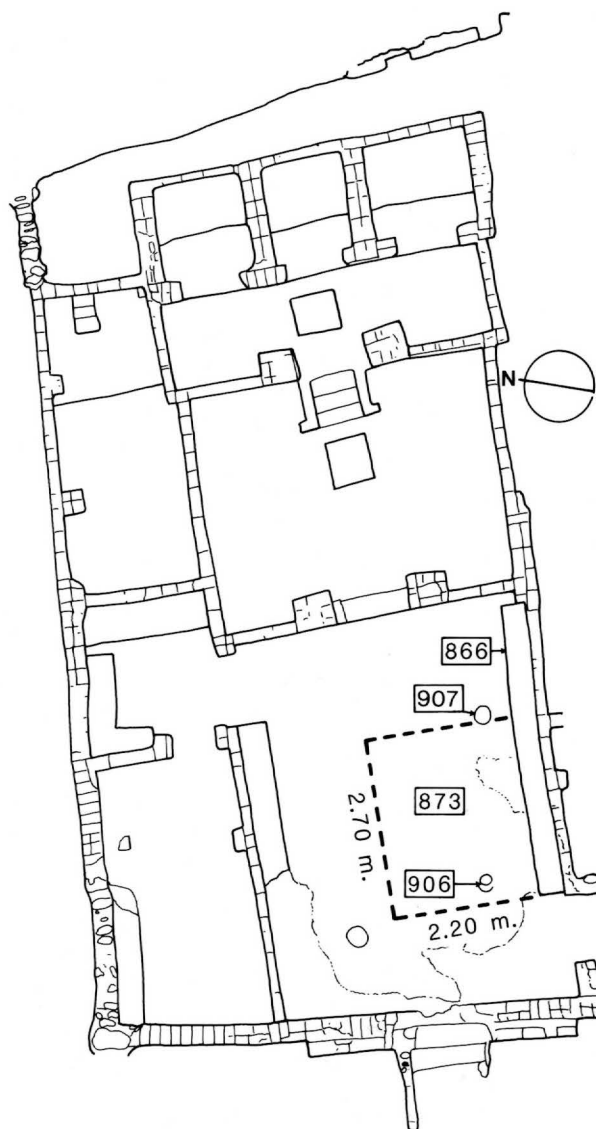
Outline plan of the Main Chapel showing the area of floor in the Outer Hall separately studied in 1985.
